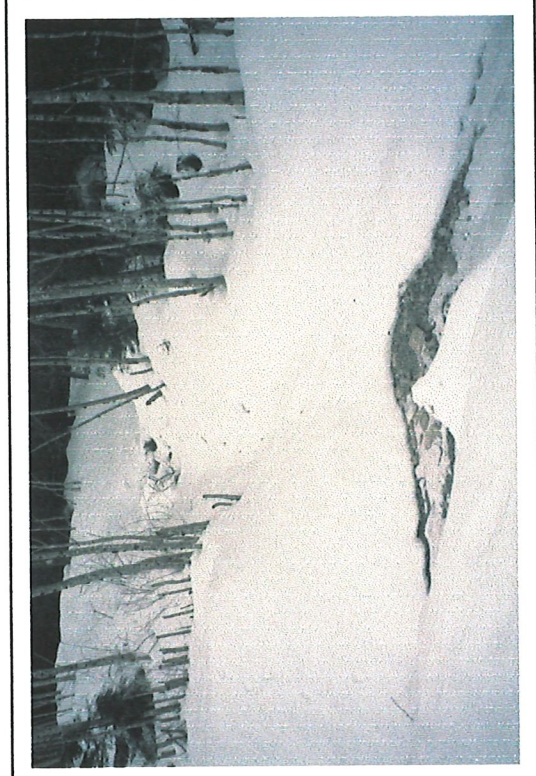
Looking upstream into the channel from Site 9. Location of cobble armouring to protect outlet from erosion.
